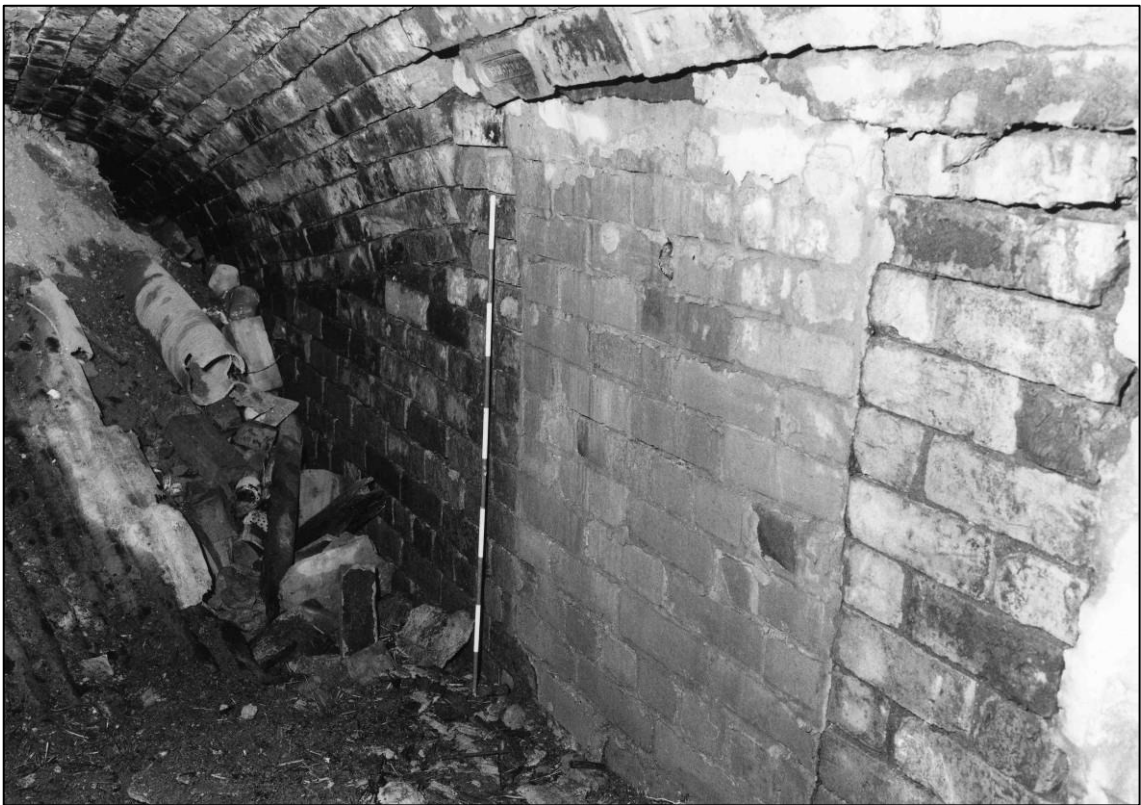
Building N4, blocked opening in north side of fan drift, looking NW (photo 4/2).
